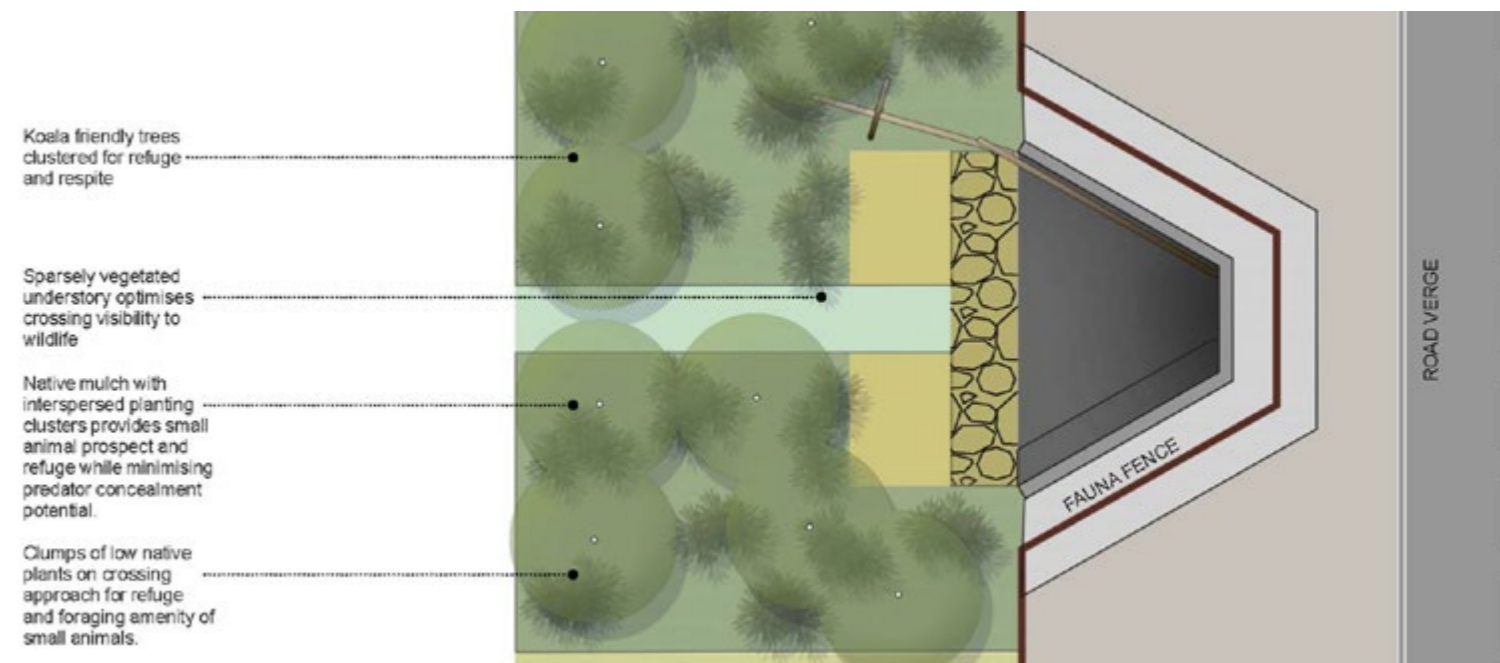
Typical fauna structure arrangement with additional planting for foraging
